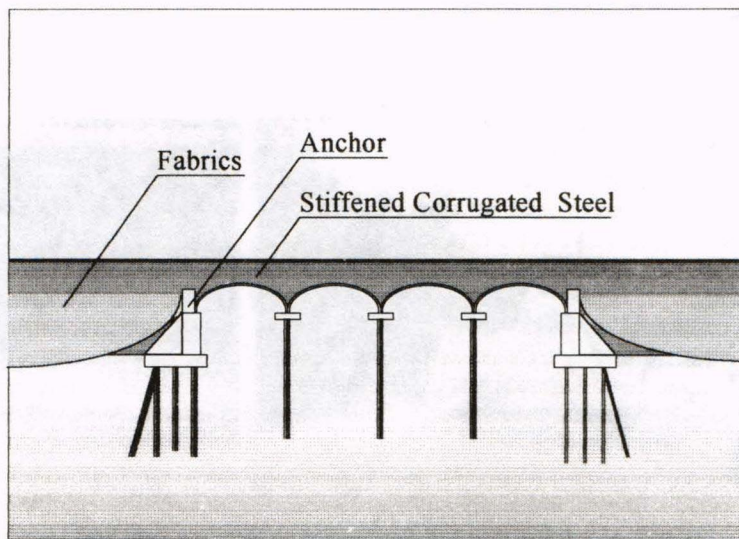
Elevated Stiffened Corrugated Steel Pile System
